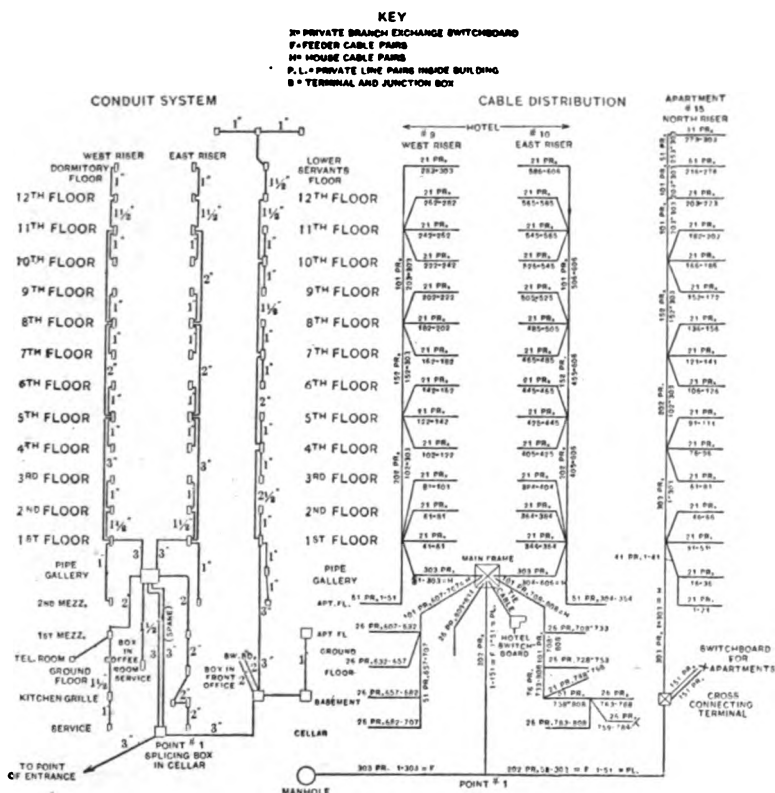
17-STORY COMBINATION HOTEL AND APARTMENT BUILDING.
